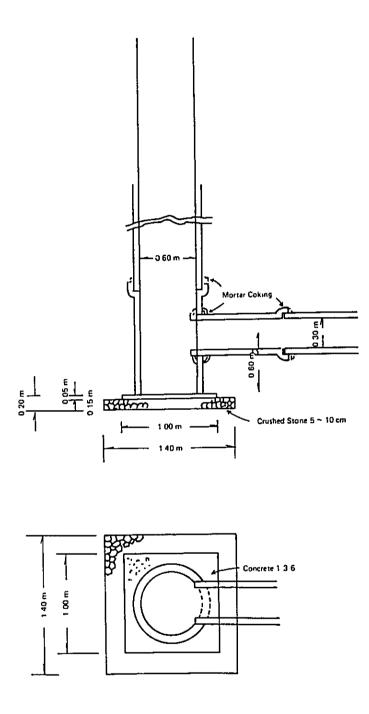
Detail Drawing of Pipe Work Footing
